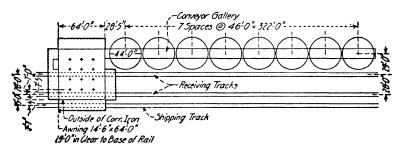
PLAN OF INDEPENDENT ELEVATOR.
